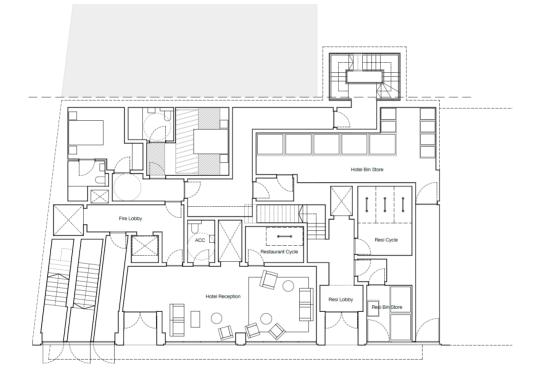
Proposed ground floor plan of 9-12 New College Parade.
